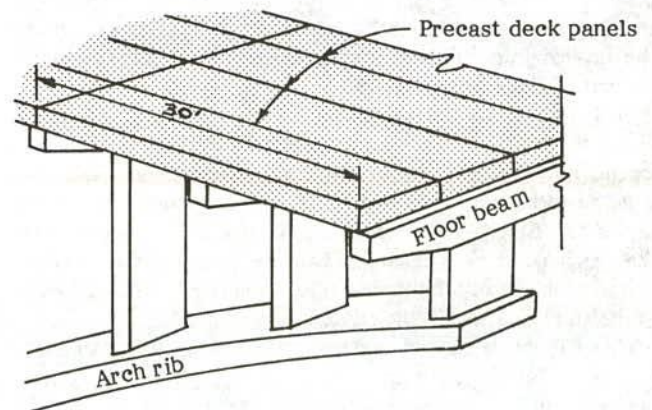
Use of precast deck panels in rehabilitation of Fremont Street bridge.
